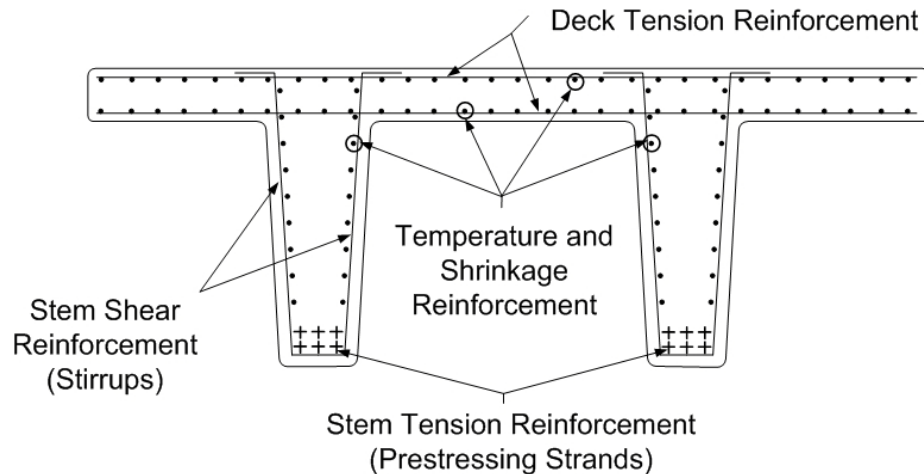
Steel Reinforcement in a Prestressed Double Tee Beam
